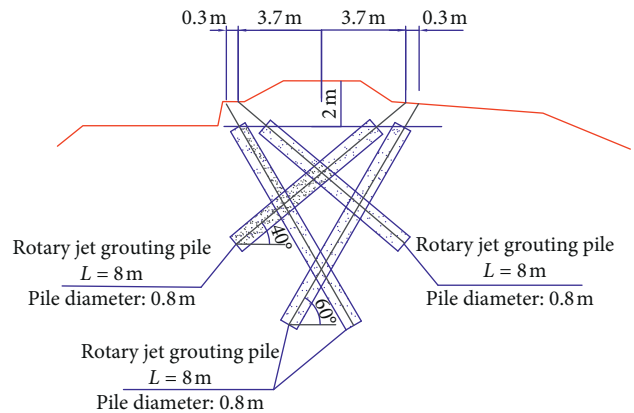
Plane layout of existing railway subgrade strengthened by inclined rotary jet grouting pile.
